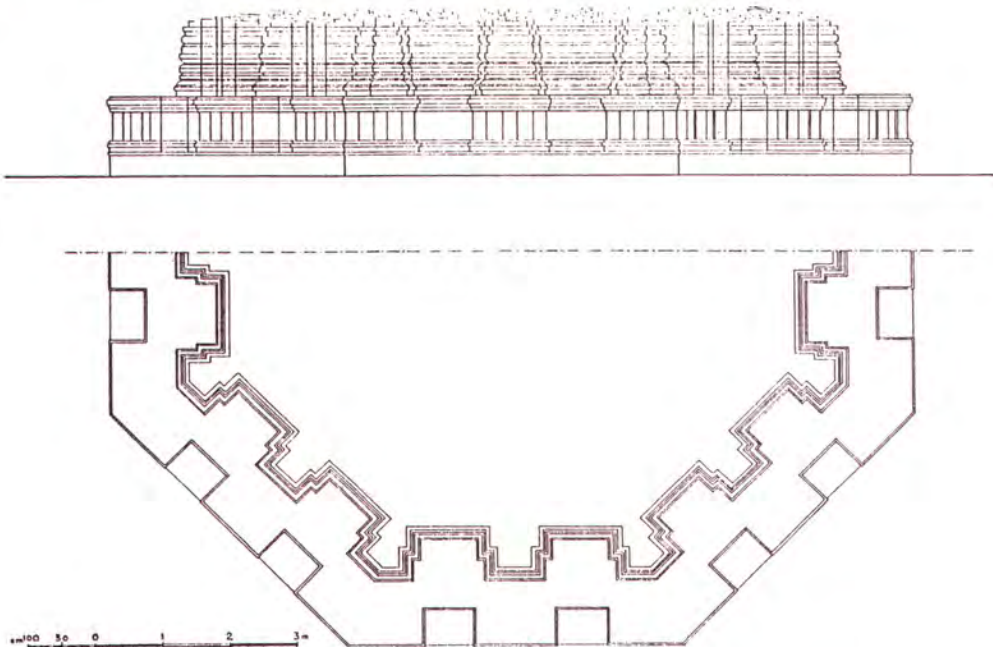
Plan and elevation of Stupa/Chedi No. 13 U-Thong, Supanburi Province.
